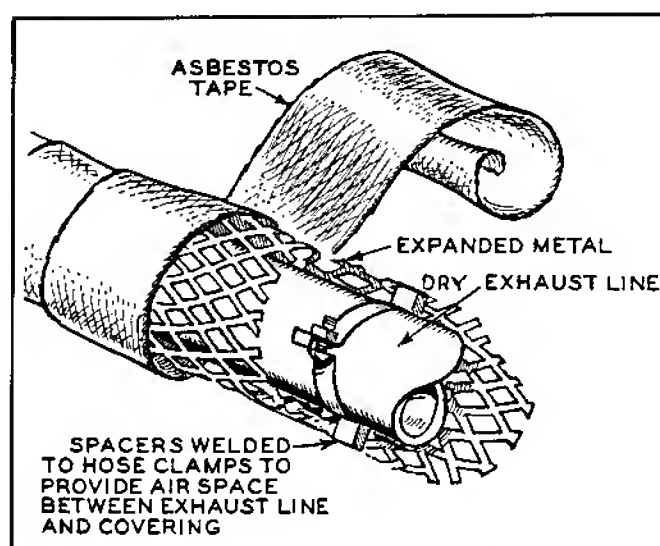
TYPICAL DRYSTACK EXHAUST PIPING
